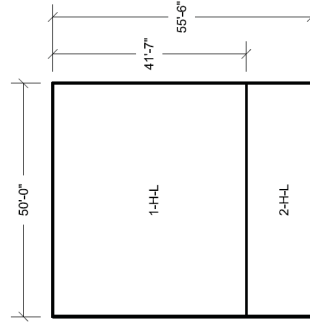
H-6-11S: COOLING TOWER EAST WALL LOOKING WEST
